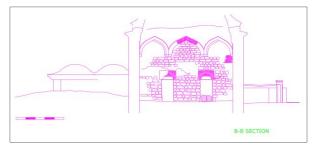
Plan Havsa Sokollu Bath, section B-B (Endowment office Edirne, 2012).
